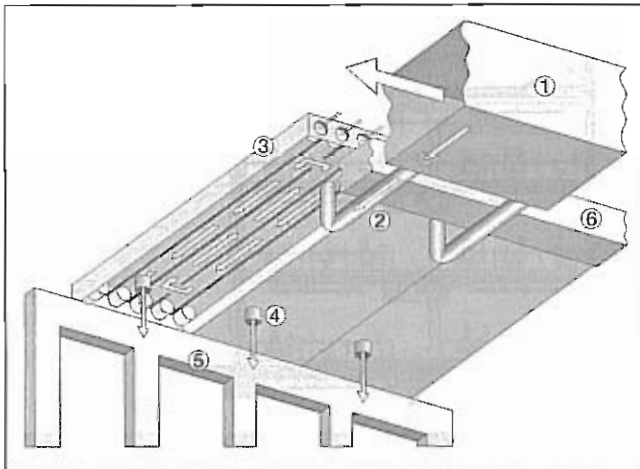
The Termodeck air supply system: 1, primary air supply duct; 2, terminal air supply duct; 3, Termodeck adapted floor plank; 4, air supply grille; 5, load-bearing wall panel; 6, central supporting beam
